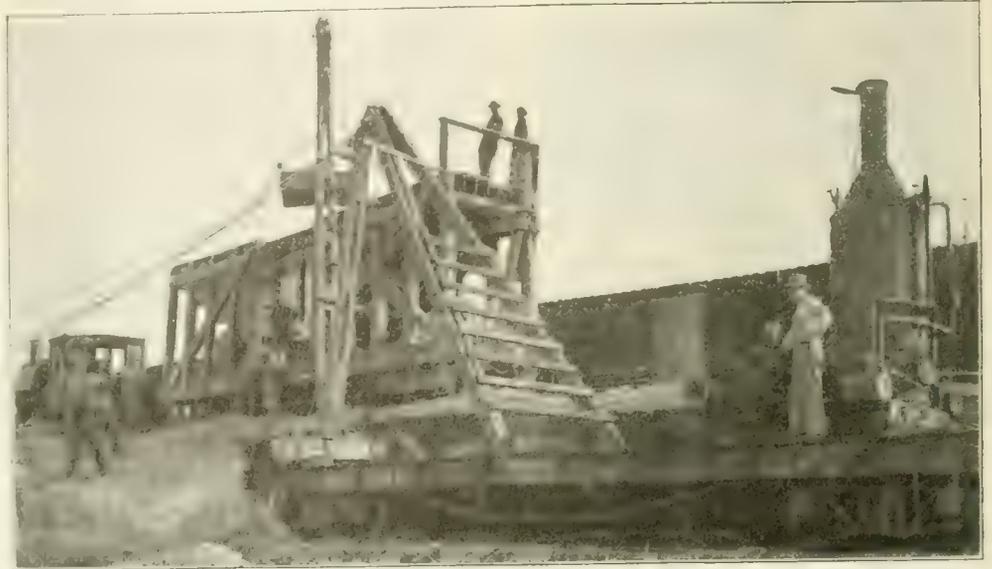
View Showing Loading of Bins on Mixer Car for the Lining, by Compressed Air Method, of C., B. & Q. R. R. Tunnel at Arminto, Wyo.
